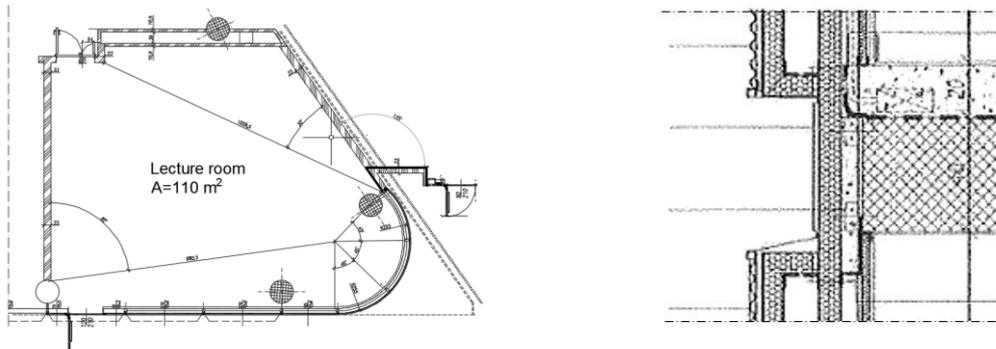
Floor plan of the analysed lecture room and detail of the external wall.
